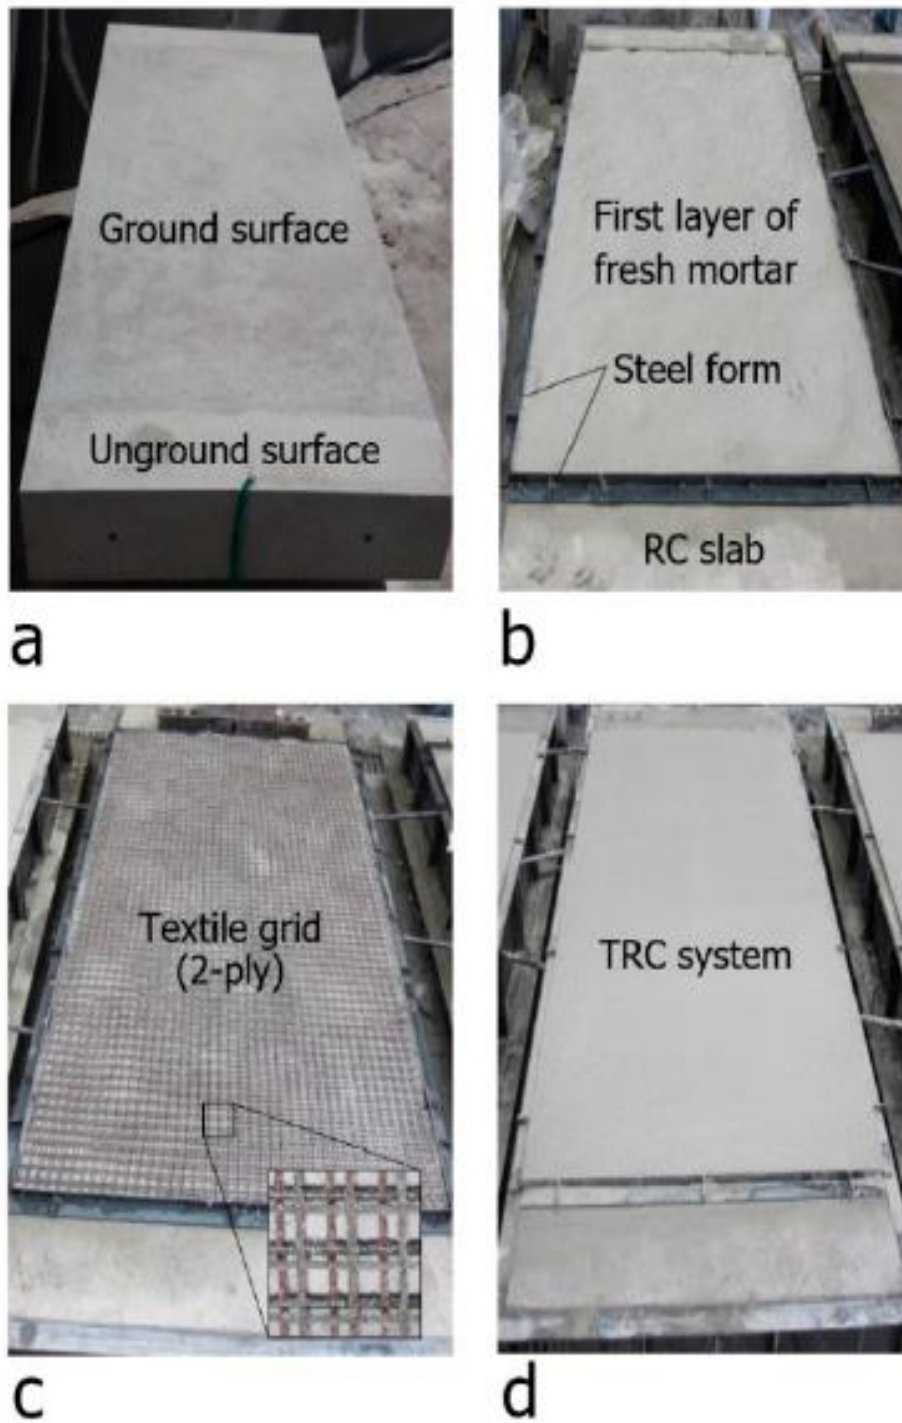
Fabrication process of a full-Scale Slab Specimen (Kim, You, Ryu, Ahn, & Koh, 2021)
